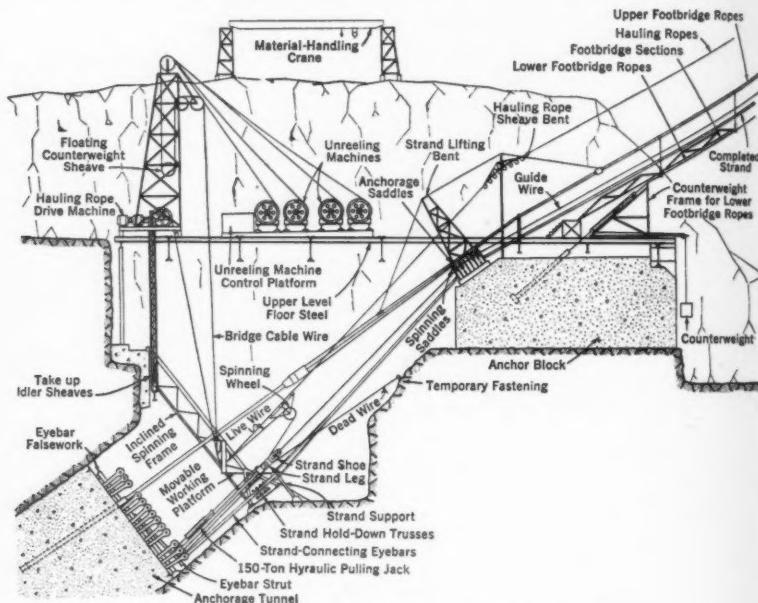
SECTION AT NEW JERSEY ANCHORAGE.
